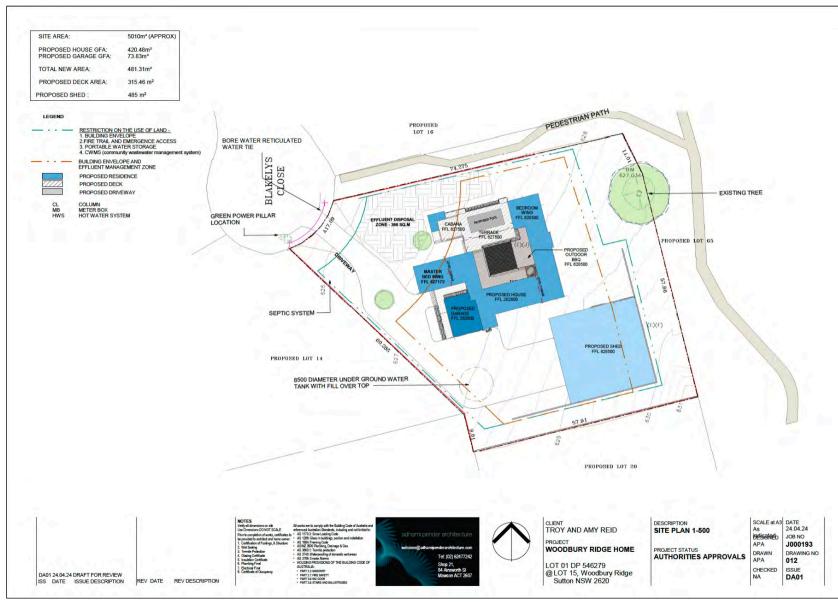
Site plan (Adhami Pender Architects, 2024)
